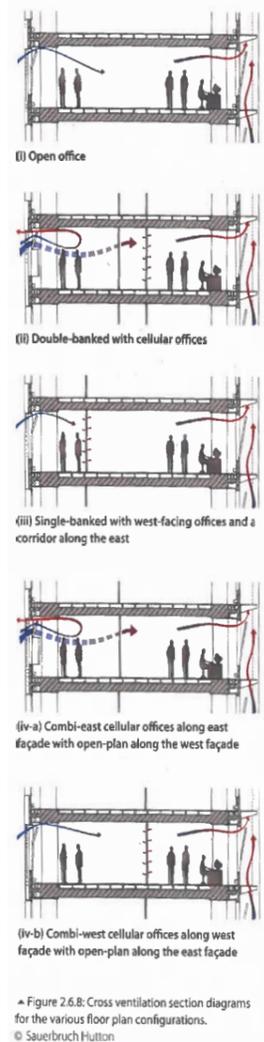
Cross ventilation section diagrams for the various floor plan configurations. © Sauerbruch Hutton
